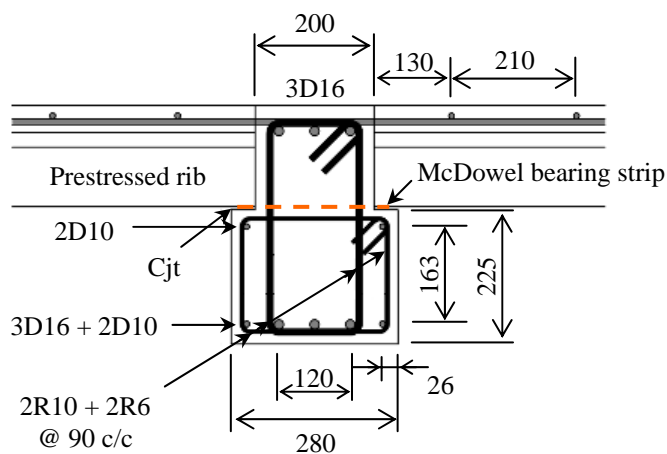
Dimension and layout of the sub-assembly (units in mm)
